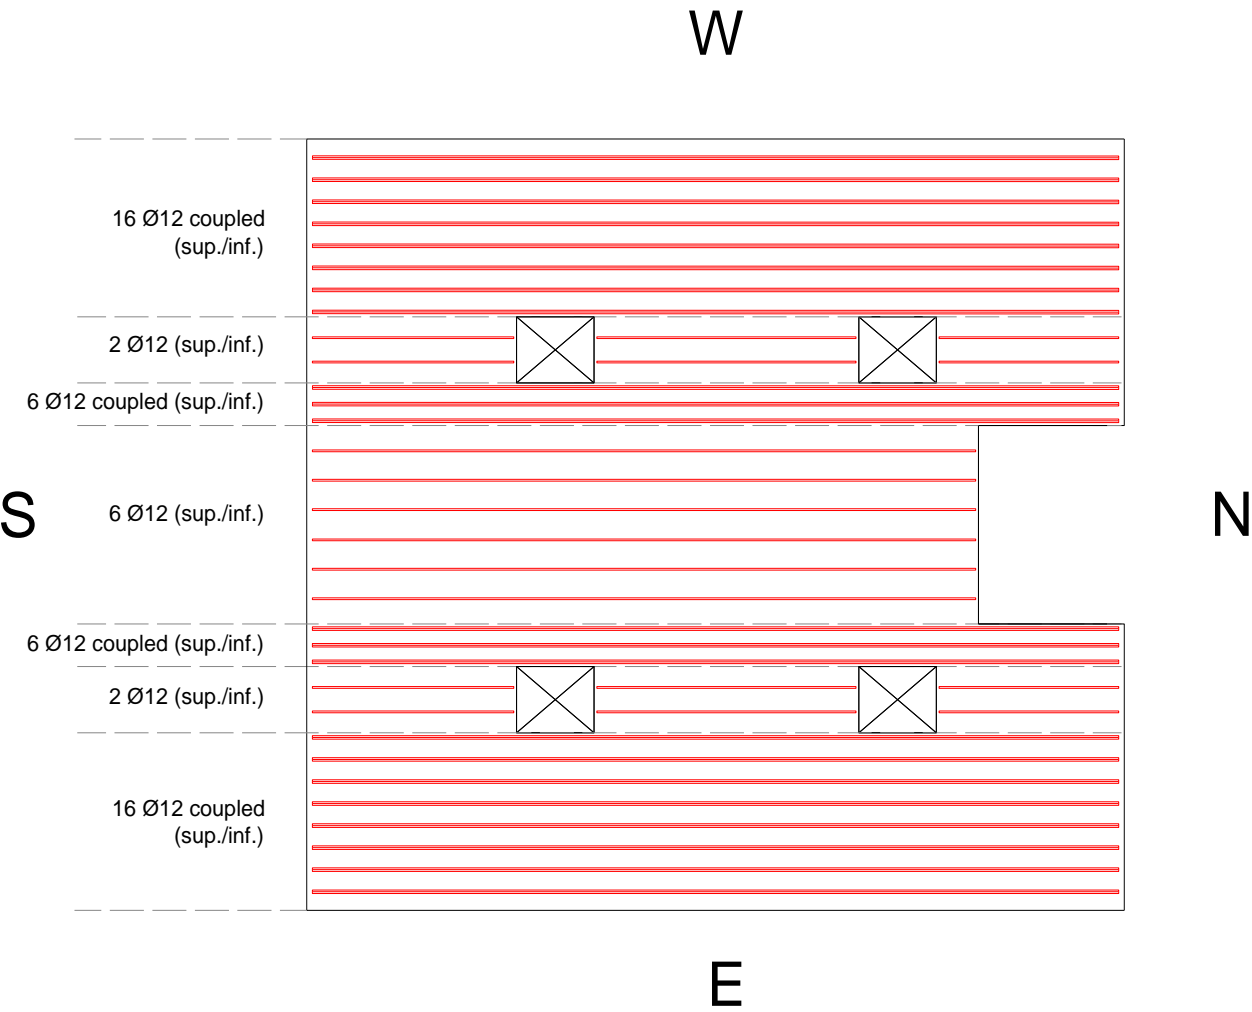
Reinforced concrete slab: North-South top and bottom reinforcement plan view.
